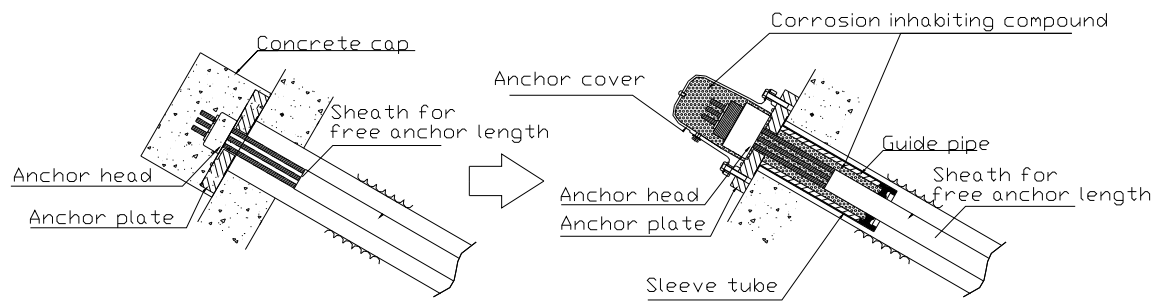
Repair and enhancement for the anchor head and underhead part(Below the bearing plate)
